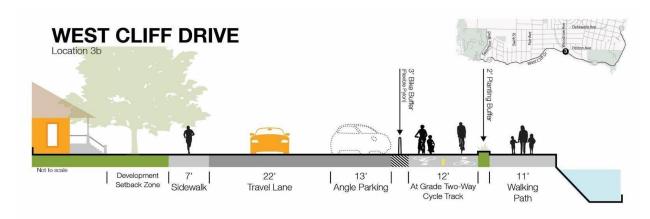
Alternative 2 Concept- Cross Section of parking lot on West Cliff Drive, east of Woodrow Avenue
